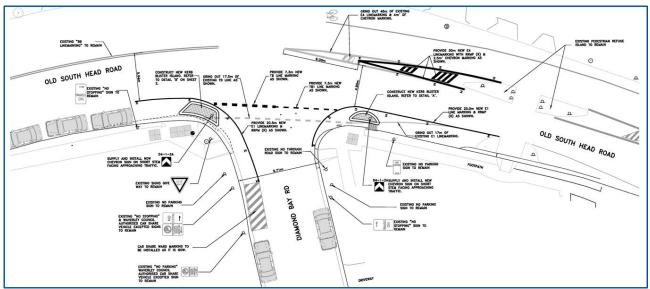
Approved design at Old South Head Road and Diamond Bay Road (September 2020 Council meeting)
